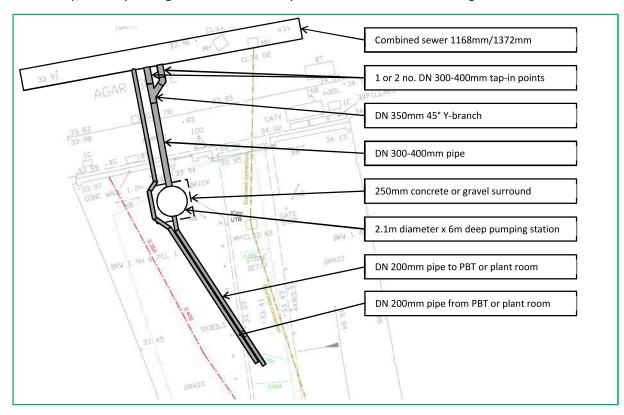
Sewer connection – option 1 (standard pumping station with submersible pumps)
